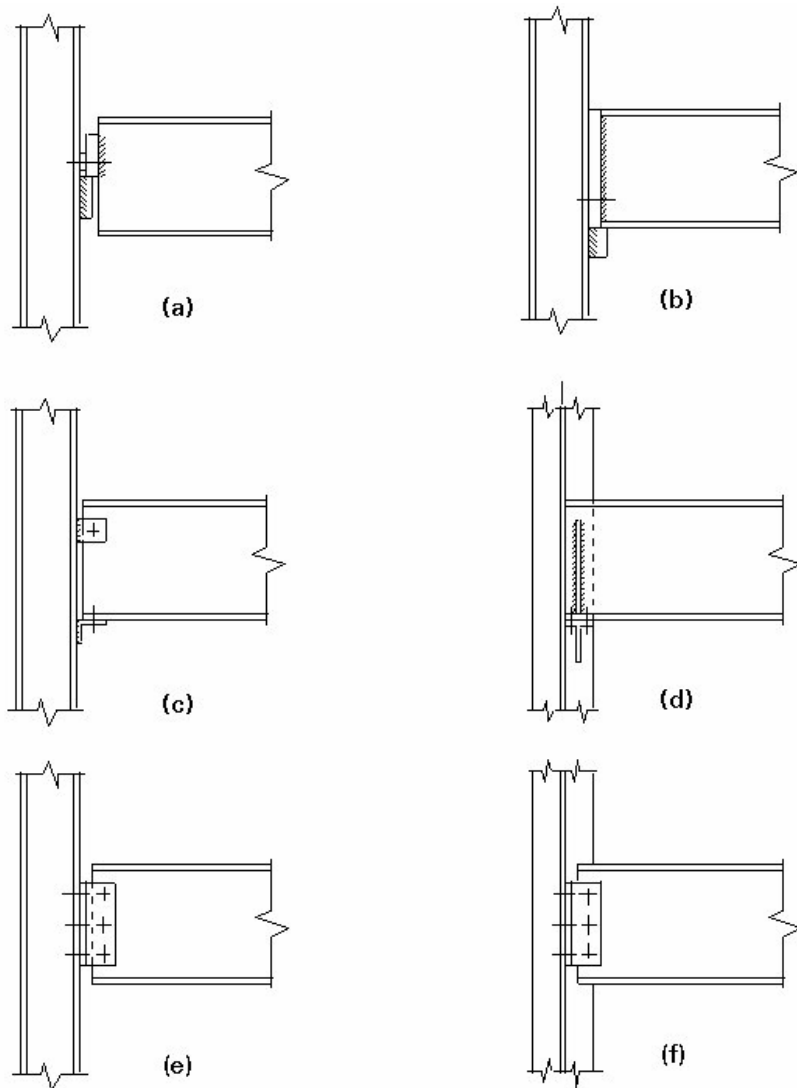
Steel beam-to-column connections in a braced steel frame [29]
